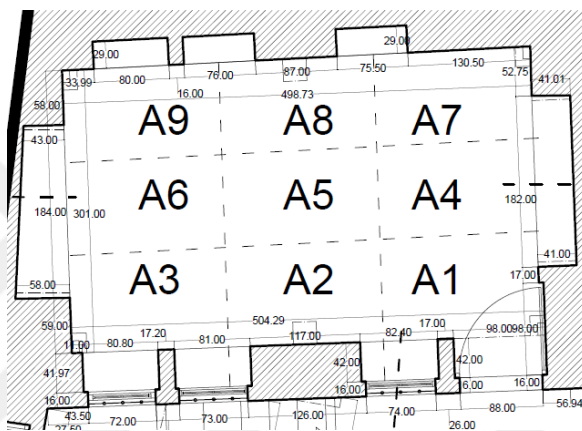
Sample room dividing plan 1 (TEMA 2008, Organized by Author)
